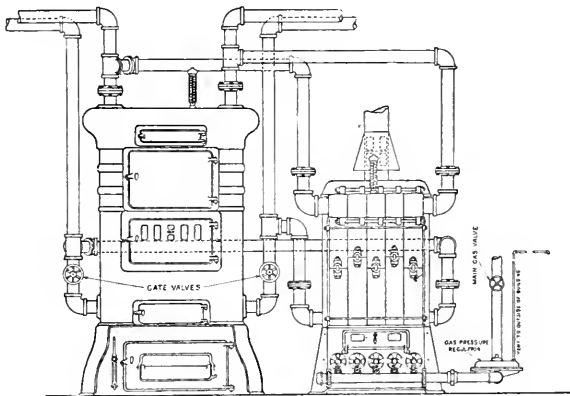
TANDEM INSTALLATION OF COAL- AND GAS-FIRED BOILERS FOR HOT-WATER HEATING
